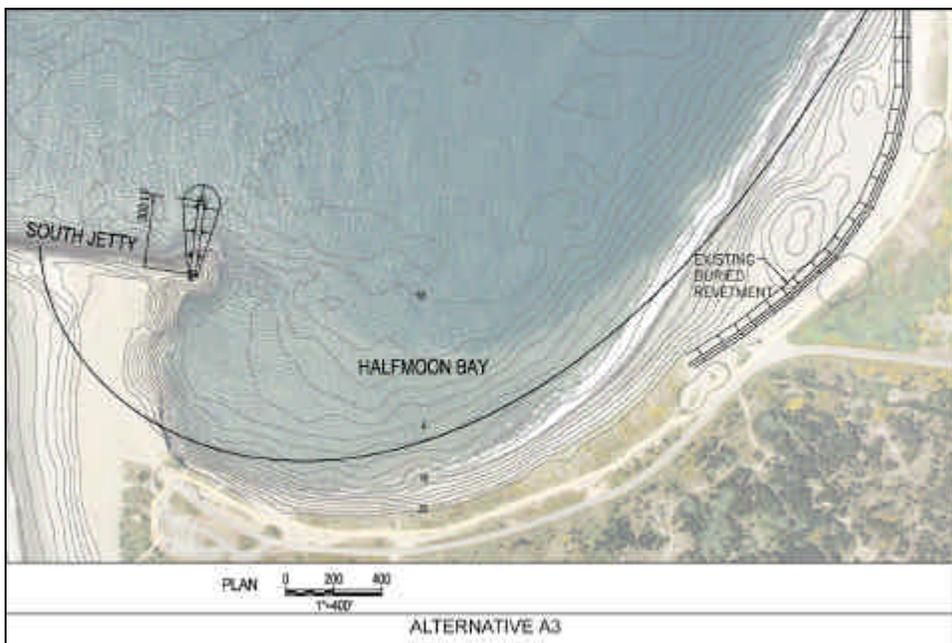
Equilibrium planshape for a control point consistent with Alt A3
